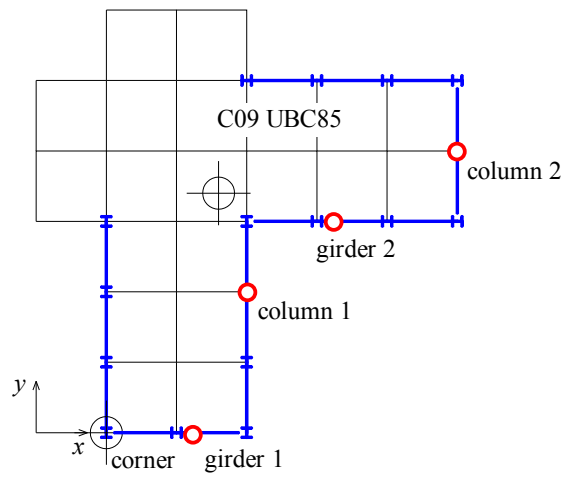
Schematic plan view of the C09 UBC85 building with girder 1, girder 2, column 1 and column 2 noted.
